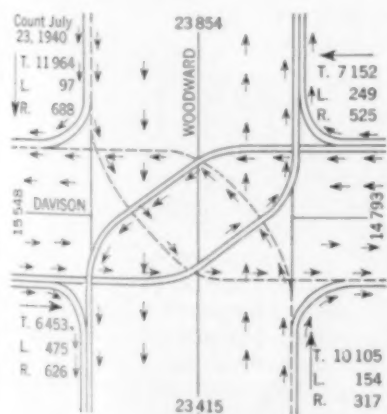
TRAFFIC COUNT AT WOODWARD-DAVISON AVENUE CROSSING, BEFORE CONSTRUCTION OF EXPRESS HIGHWAY
